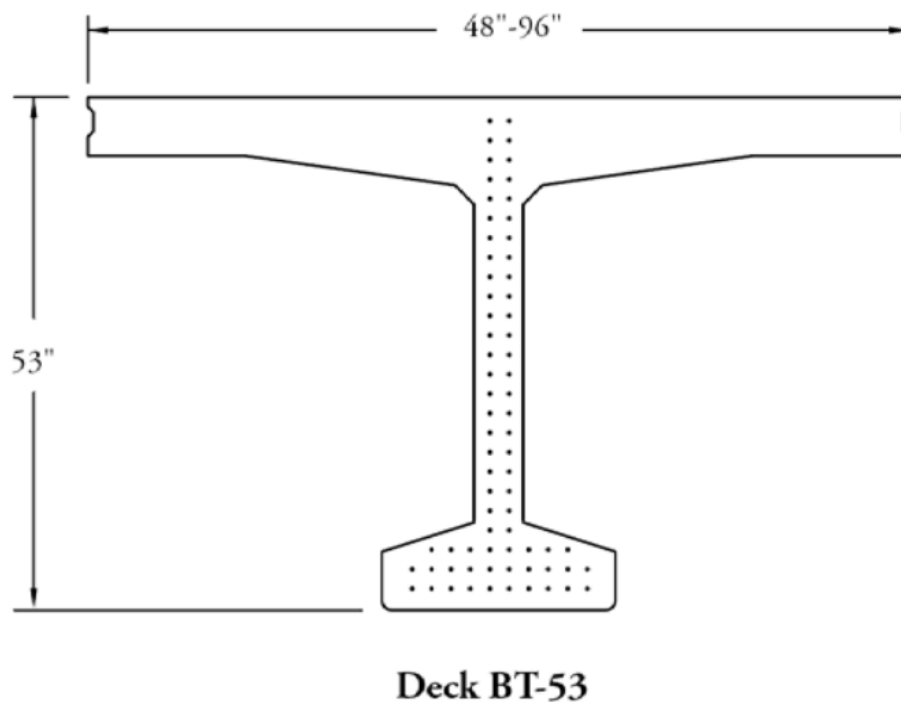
PCI Deck Bulb Tee Cross Section and Permissible Strand Locations. Accessed from (Precast/Prestressed Concrete Institute, 2023).
